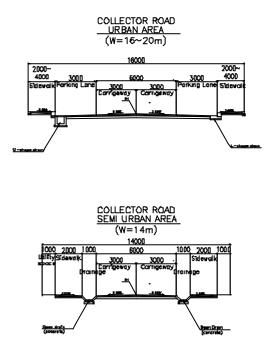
(2) Proposed Typical Cross-sections (Collector Roads)
